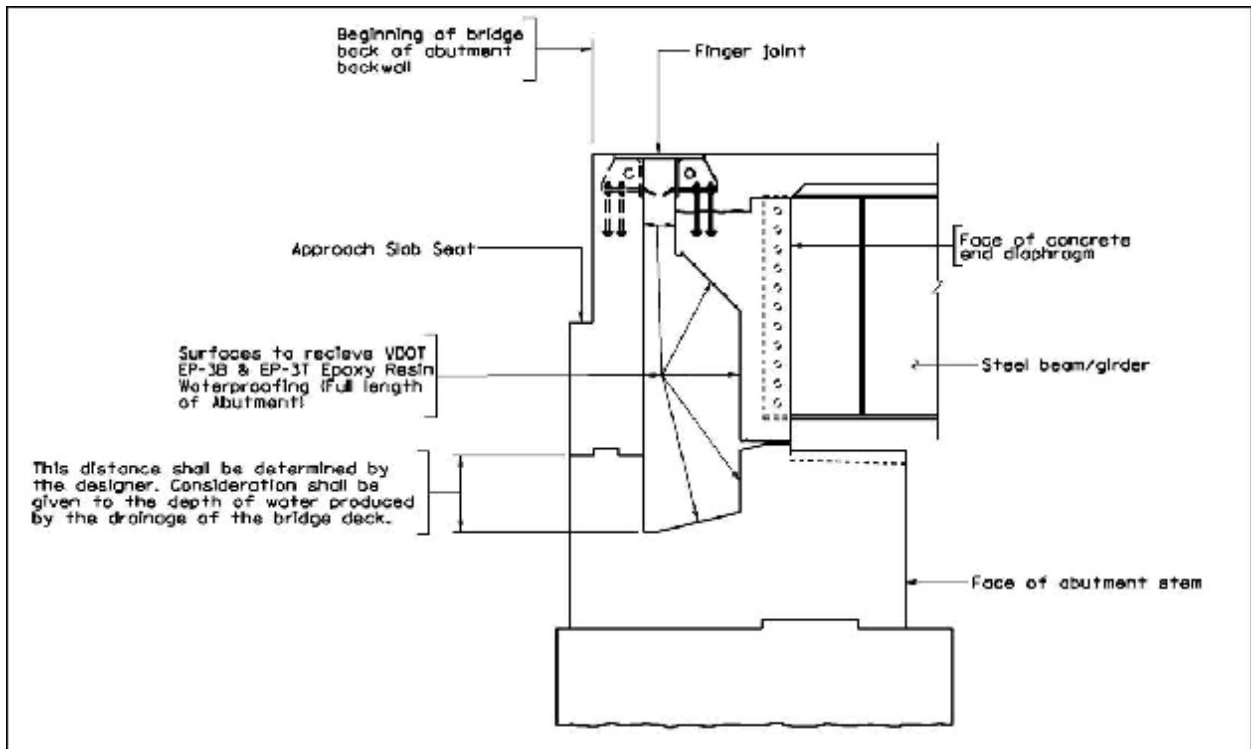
Example shifted joint detail (courtesy of Virginia DOT)
